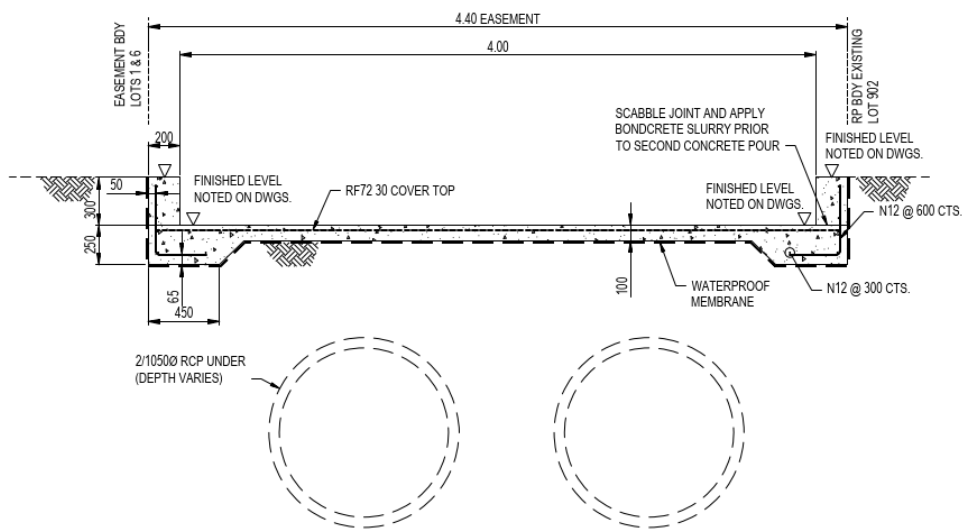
Cross Section of Twin 1050 RCPs between Manhole 2/1 and 1/1
